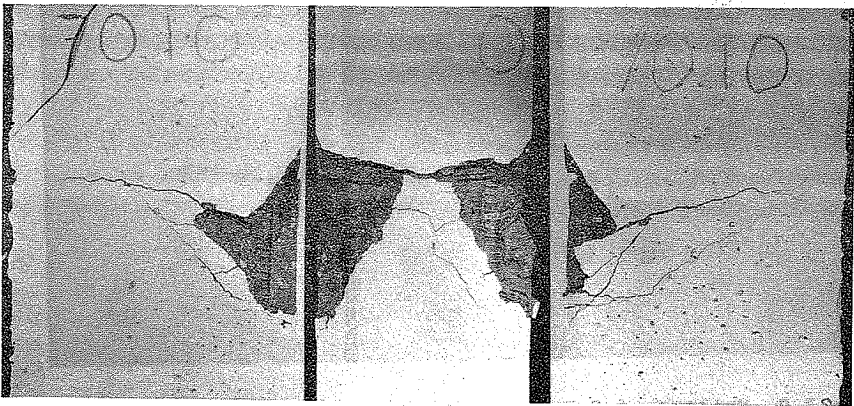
Failure of S.B.-specimen No. 70/10.
